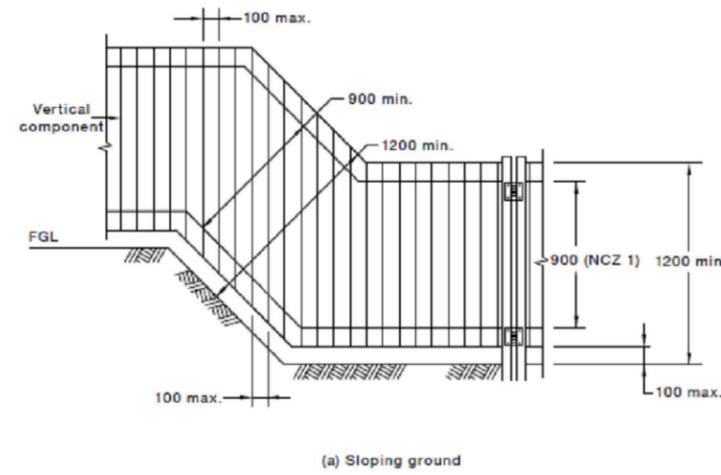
(in part) PERPENDICULAR BARRIER DIMENSIONS
